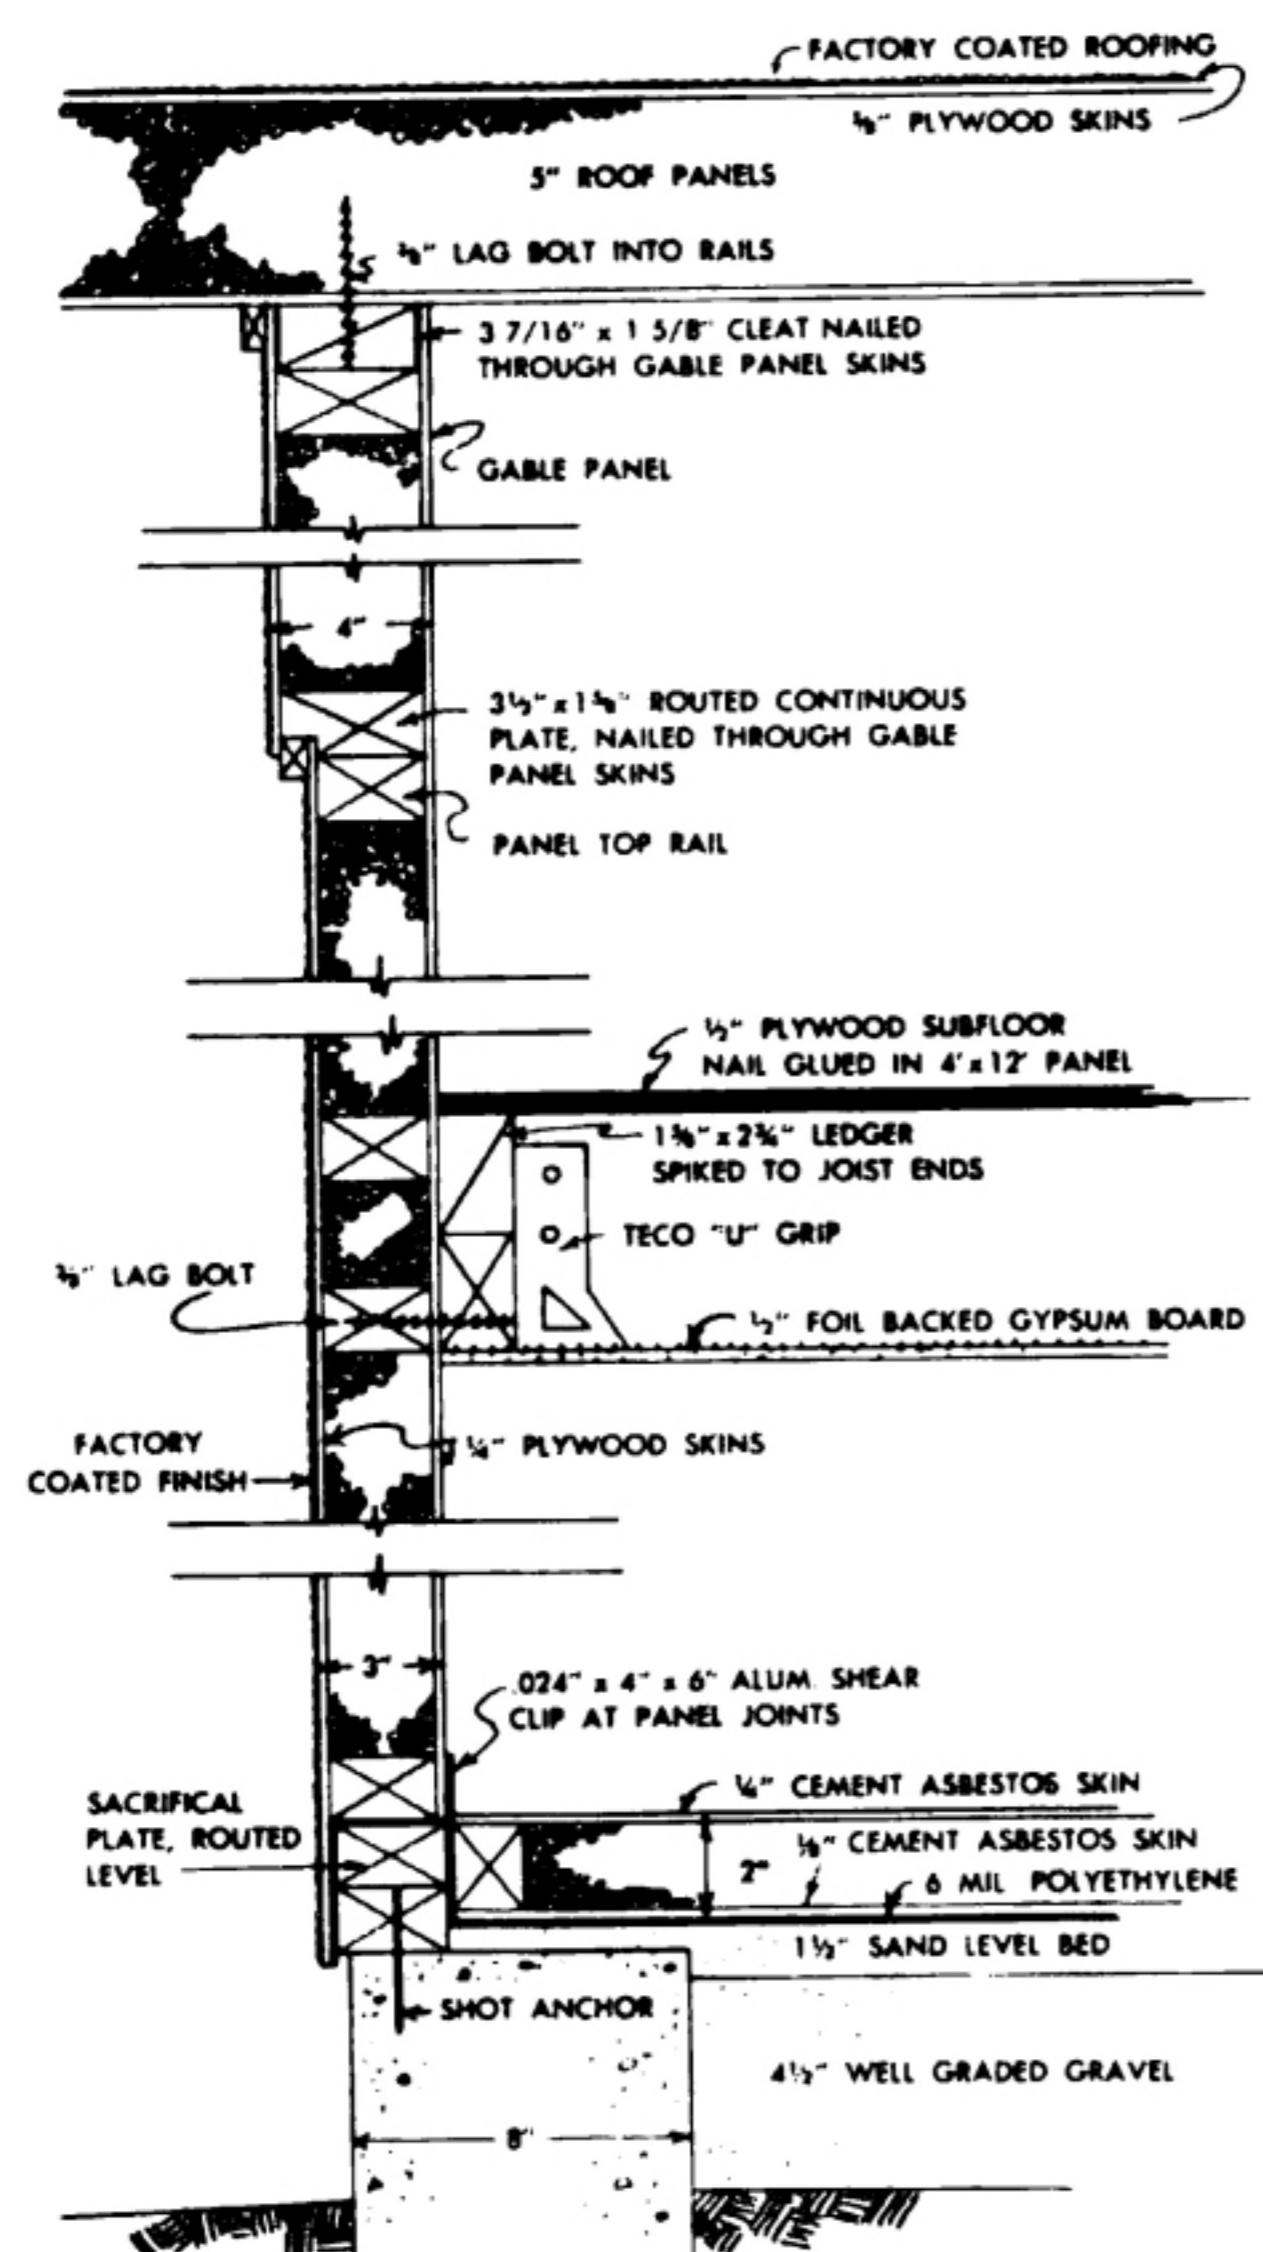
Section through end wall, floor slab, second floor and roof
